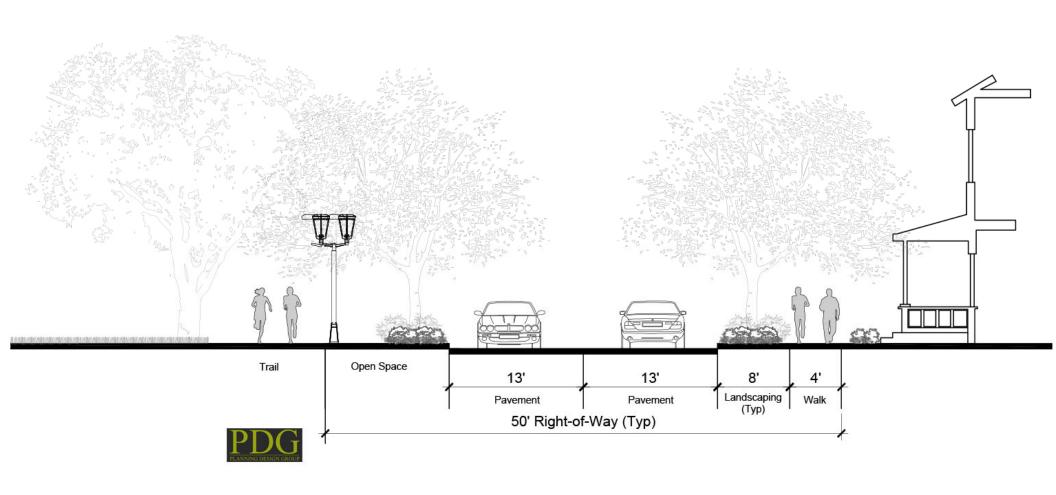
EXHIBIT K: STANDARD RESIDENTIAL STREET SECTION
